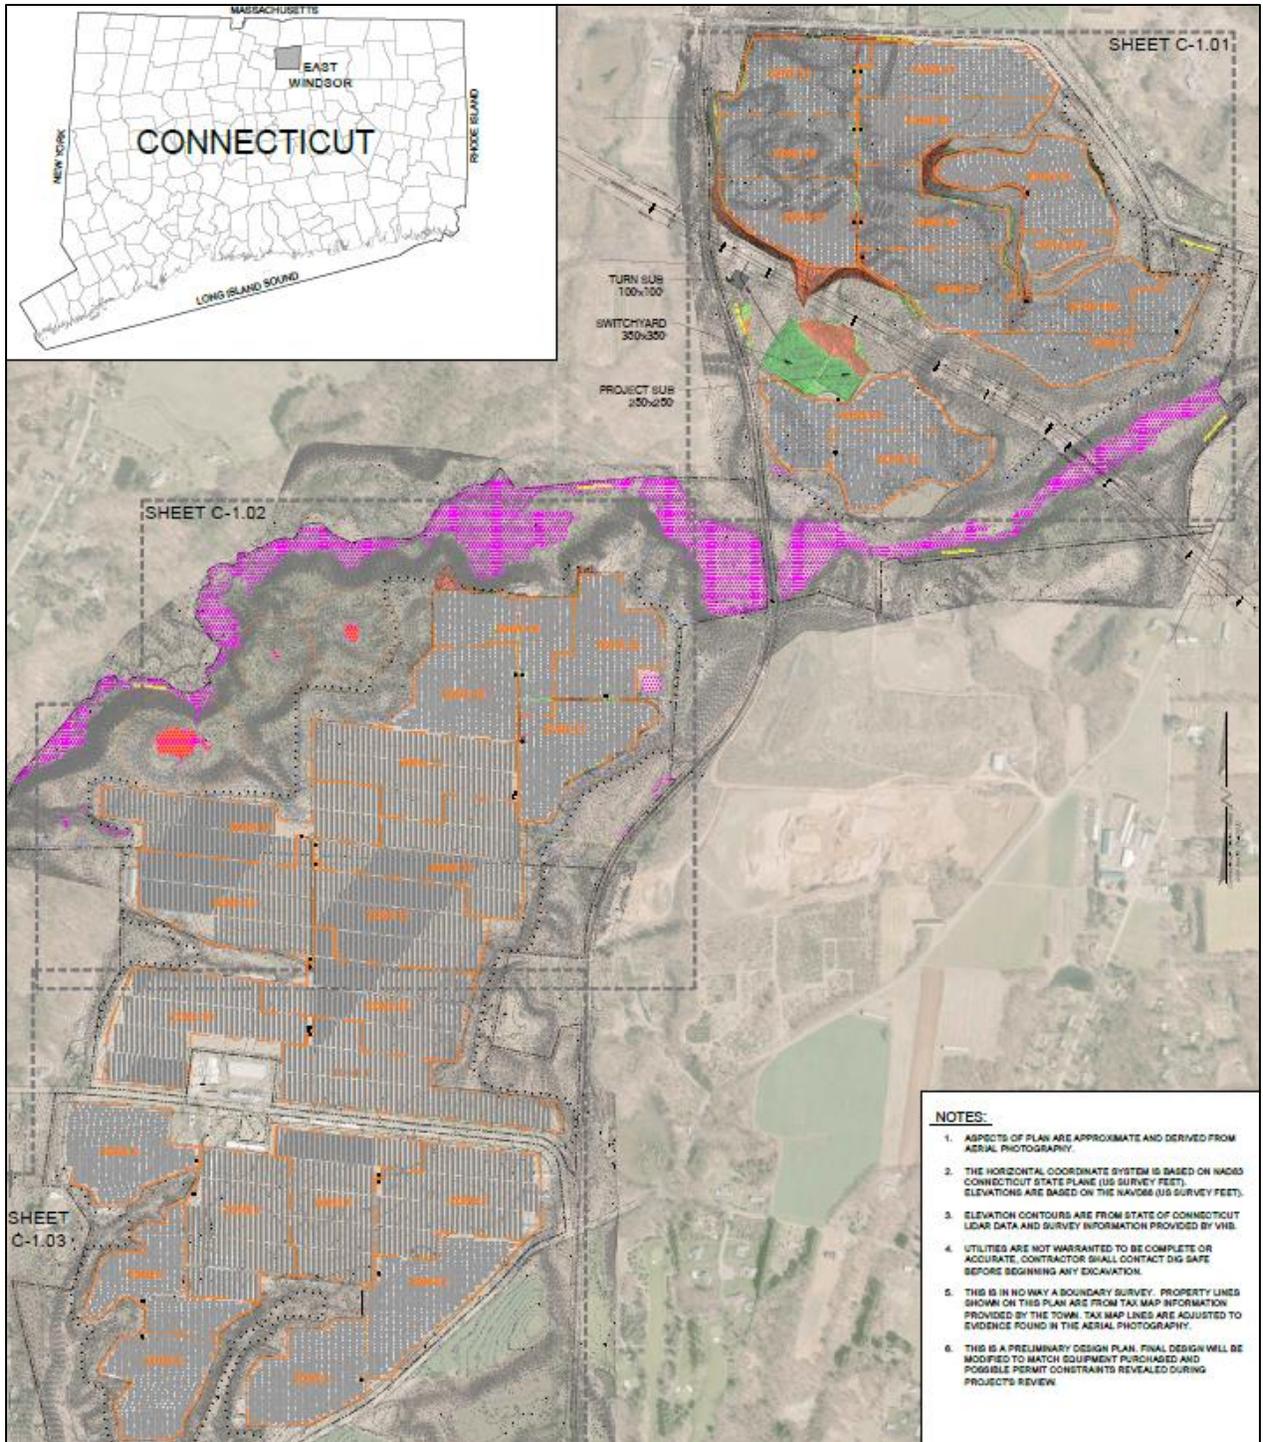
Draft plan of the proposed Gravel Pits Solar facility in East Windsor, Connecticut.
